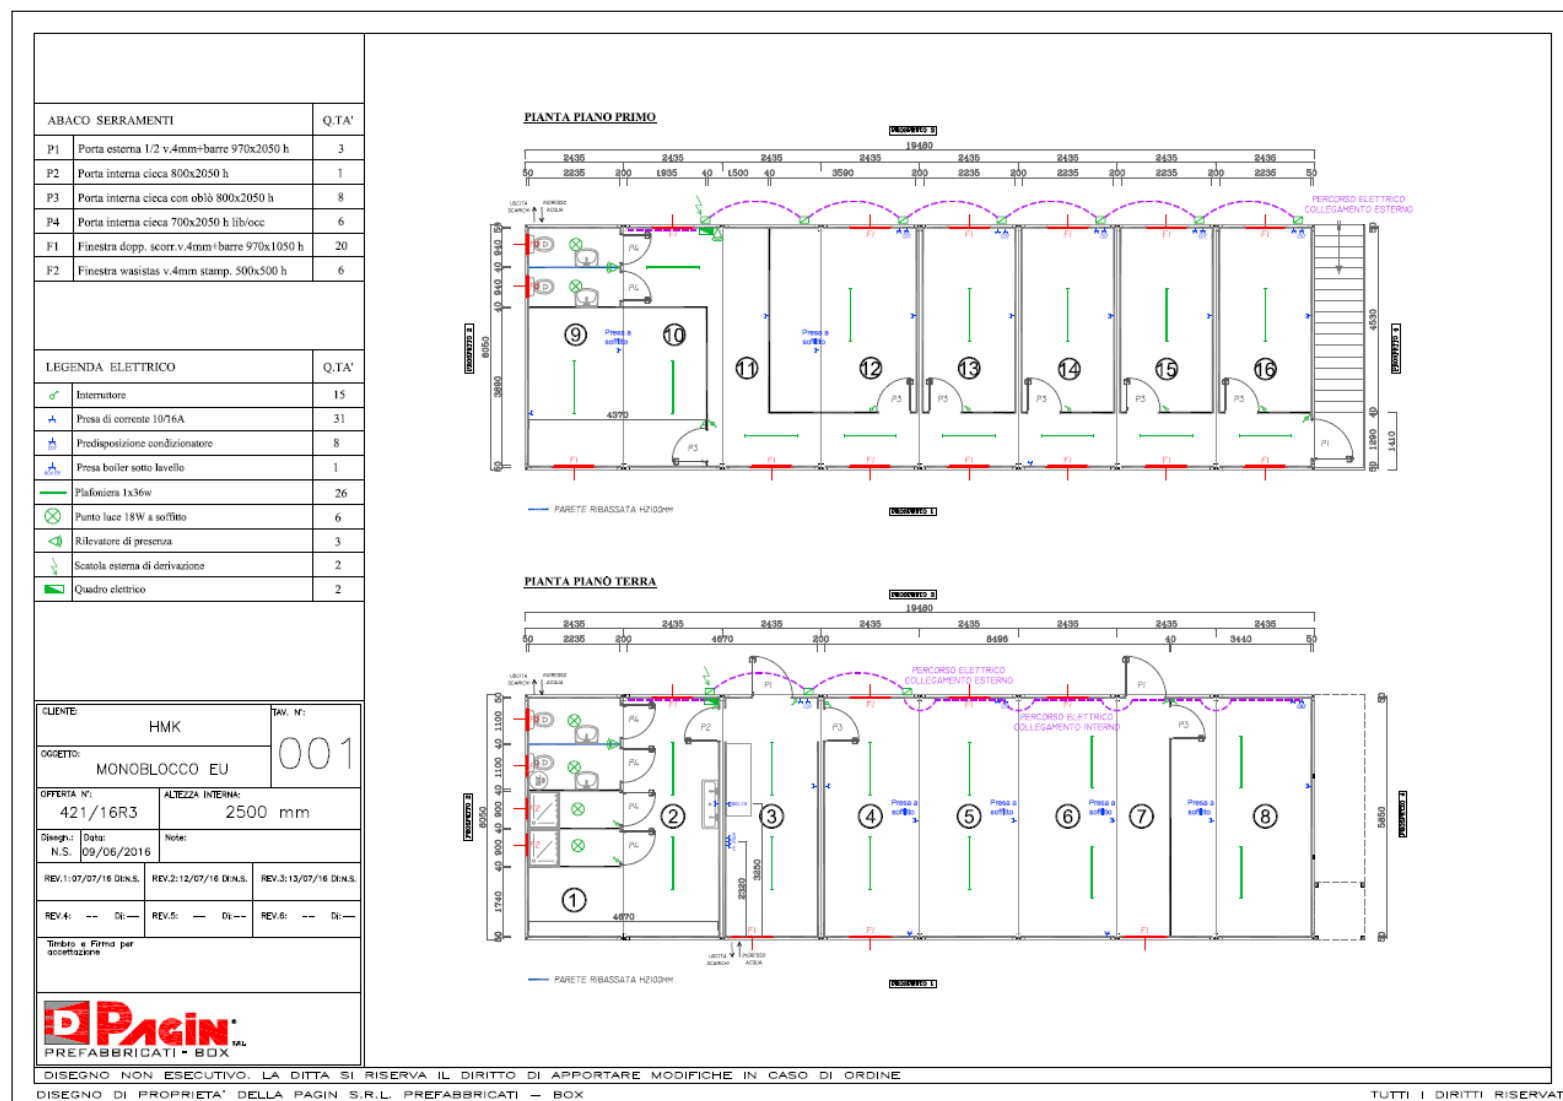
As-built plans of the Delimara 4 Portacabin Offices.
